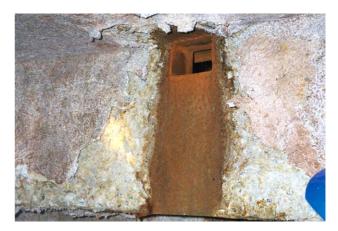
No spalling observed below window where the concrete is continuously wet.
